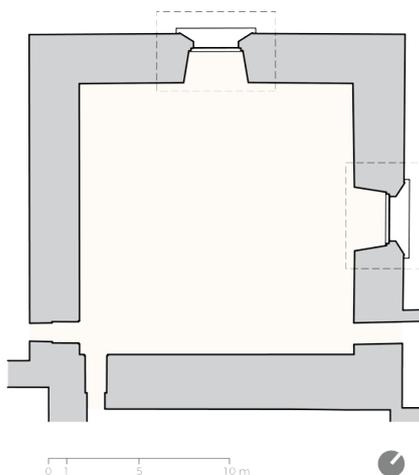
Floor plan of Sala delle Asse, which shows the orientation and location of the windows (Kolo, 2018)
